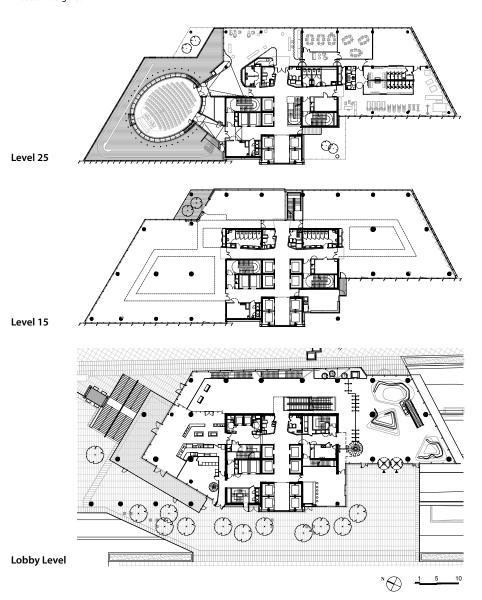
The offset-core plan afforded design opportunities such as panoramic office floor plates and elevator lobbies, and rooftop programming.
